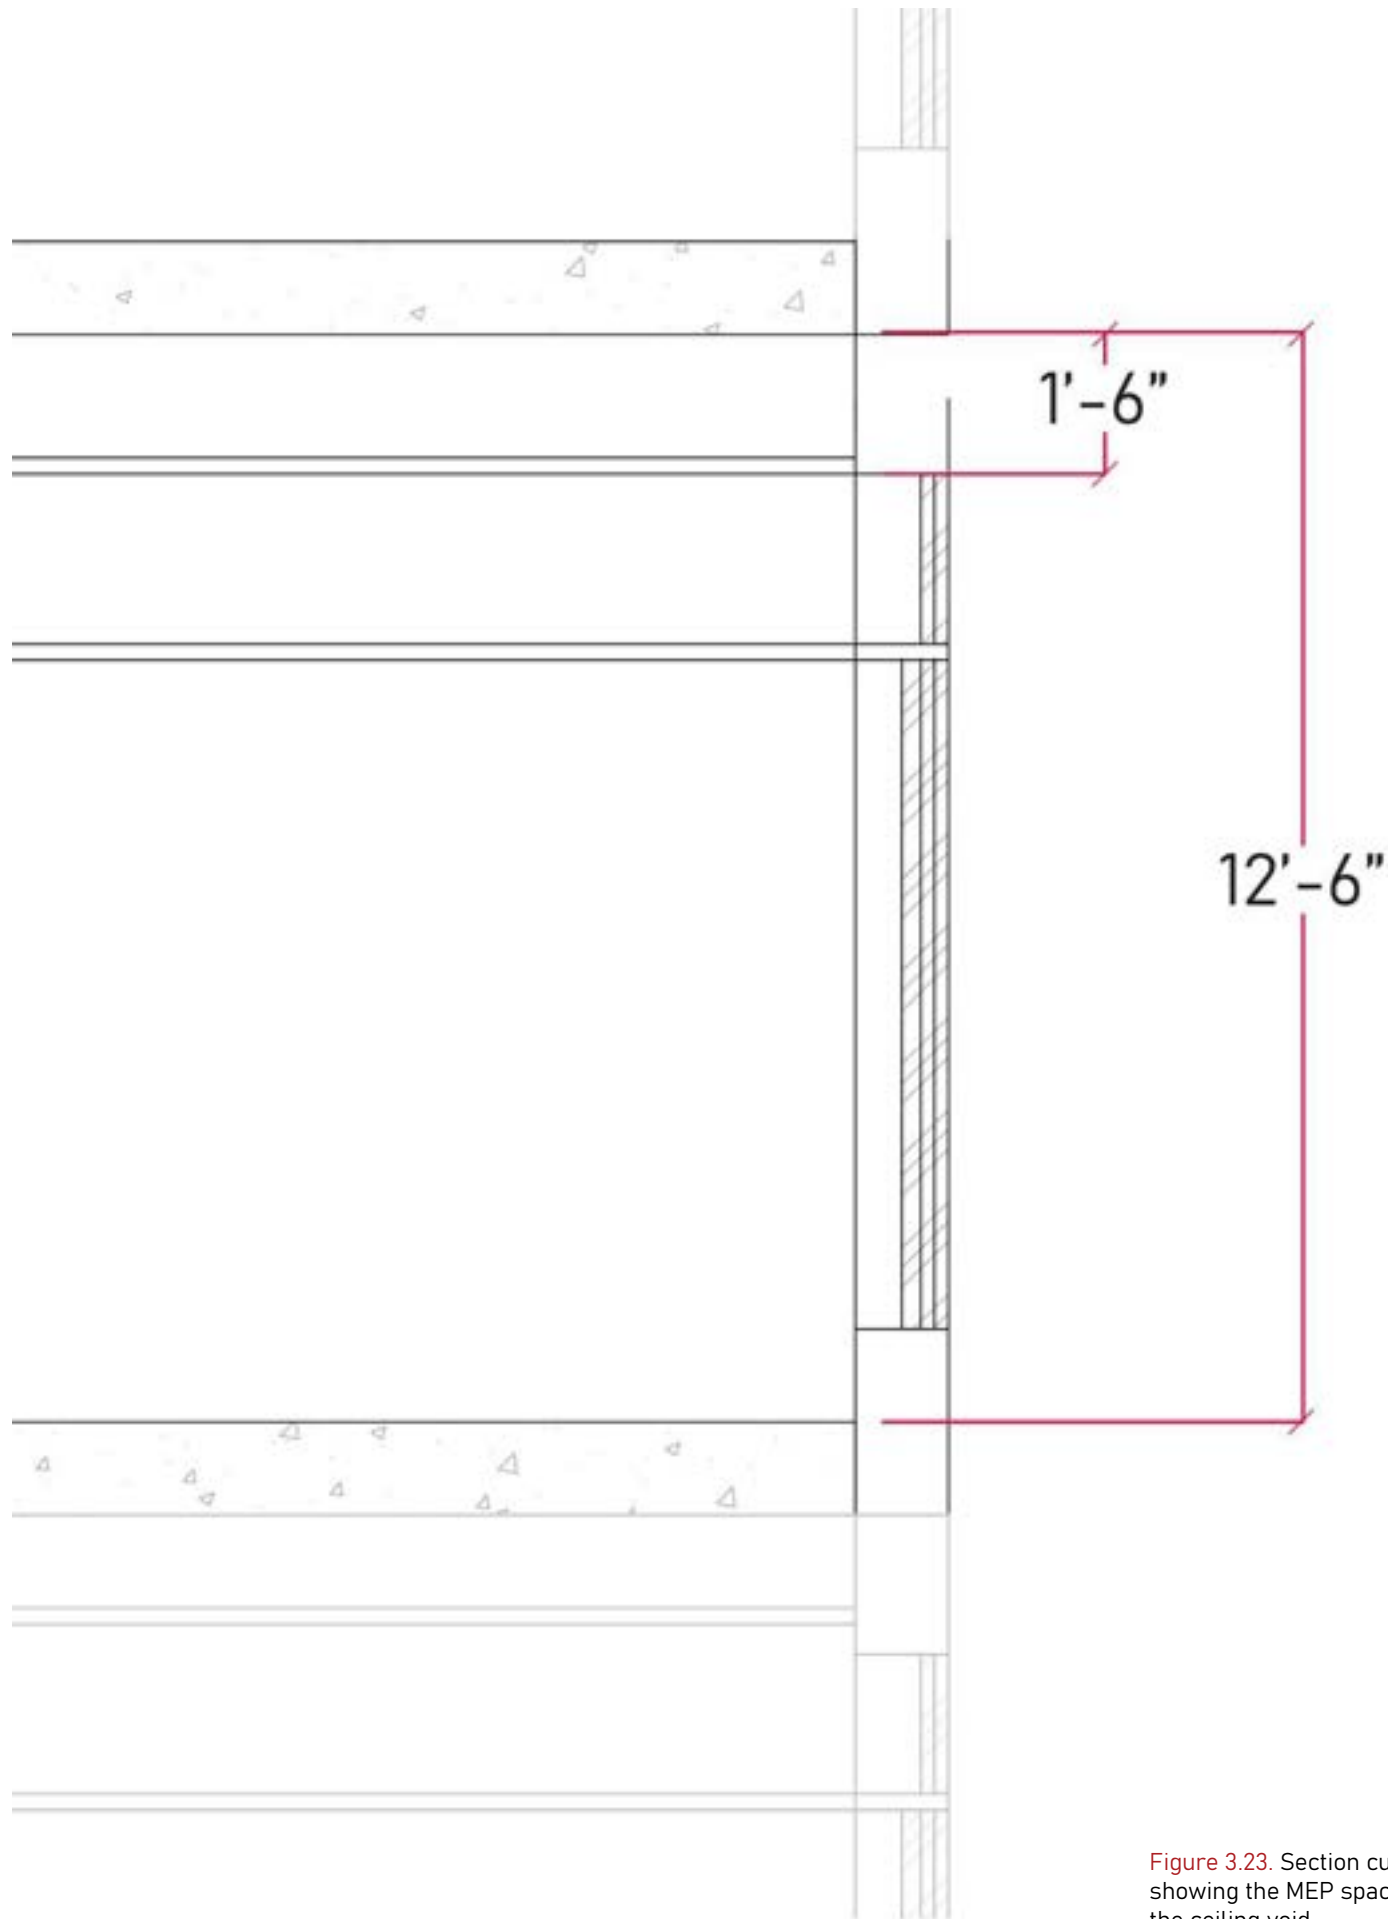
Section cut showing the MEP spaces in the ceiling void.
